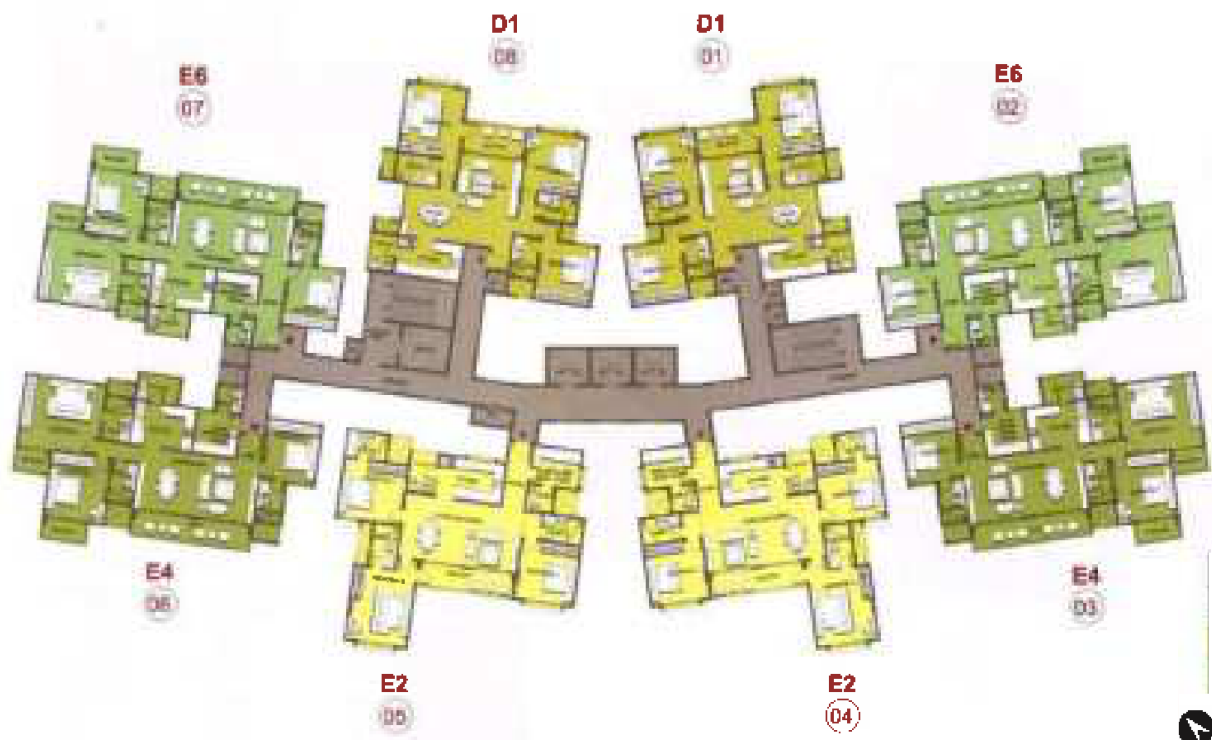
Brochure p. 44, T14 regular floor. The upper row on this rotated sheet is generally towards the apartment interior; the lower row towards the outer south-west side. North points diagonally upper left.
